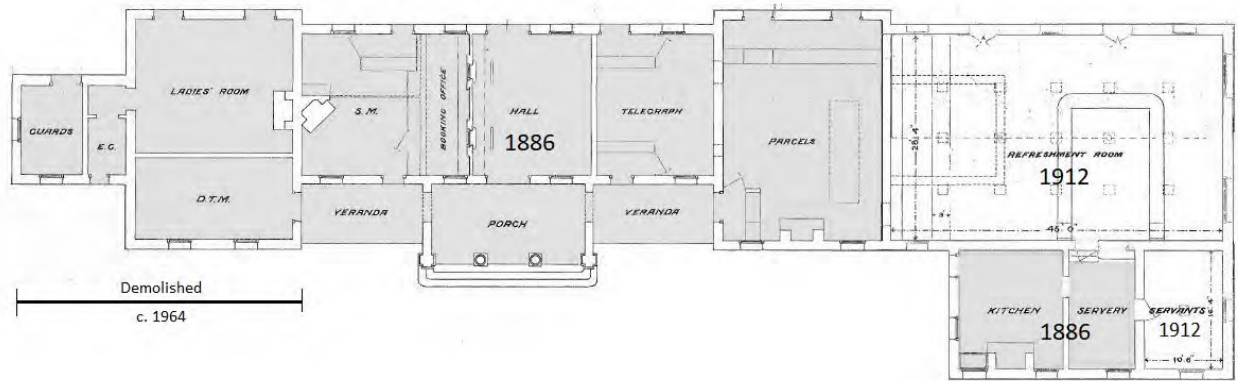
Warwick passenger station stages of construction – light grey – 1886; white – 1912; and section demolished after the 1964 fire. Source: pdArchitect.
